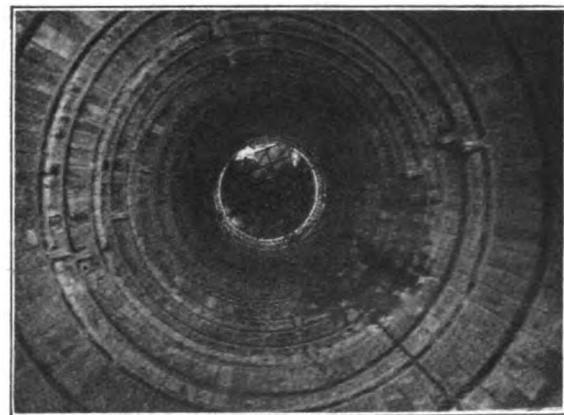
View Looking Down Sub-Pier Well Before Concrete Was Poured.
